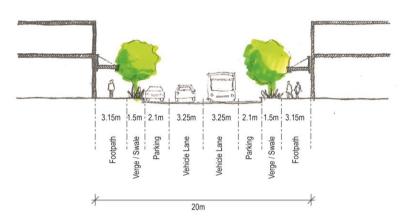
Tuakau Town Centre typical road cross sections: George Street, showing two storey high built form along road corridor
